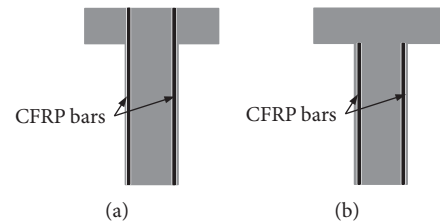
CFRP bars arrangements. (a) Anchorage in the flange. (b) On the side of the beam web.
